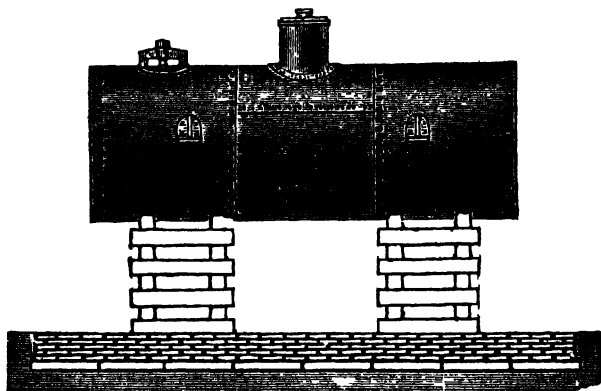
,384.—Boiler blocked up ready for setting. When the boiler is to rest on the setting walls it should be blocked up about an inch higher than its final position so that the side walls may be finished without difficulty after which the boiler may be lowered into position. The boiler front should not be required to carry any of the weight of the boiler, hence there should be about  $\frac{1}{4}$  inch clearance between the bottom of the shell and the front. The boiler should be inclined toward the rear so as to cause it to drain through the blow off easily and to give a little extra depth of water over the rear end of the tubes. If the front end of the boiler be set about 1 inch higher than the back, the desired slope will be obtained. *In levelling* the boiler crosswise, the top row of tubes should be taken to gauge by and not the faces of the steam nozzle flanges. If the nozzle flanges be but slightly out of true with the tubes the difference can probably be made up in the packing of the joint. If they be considerably out of true special flanges may be used in making up the joints. It is preferable to have the tubes level rather than the flanges. The reason for this is that with unlevel tubes it is necessary to carry a higher water line than ordinary in order not to expose the high tubes and this is unsatisfactory as it cuts down the steam space.
